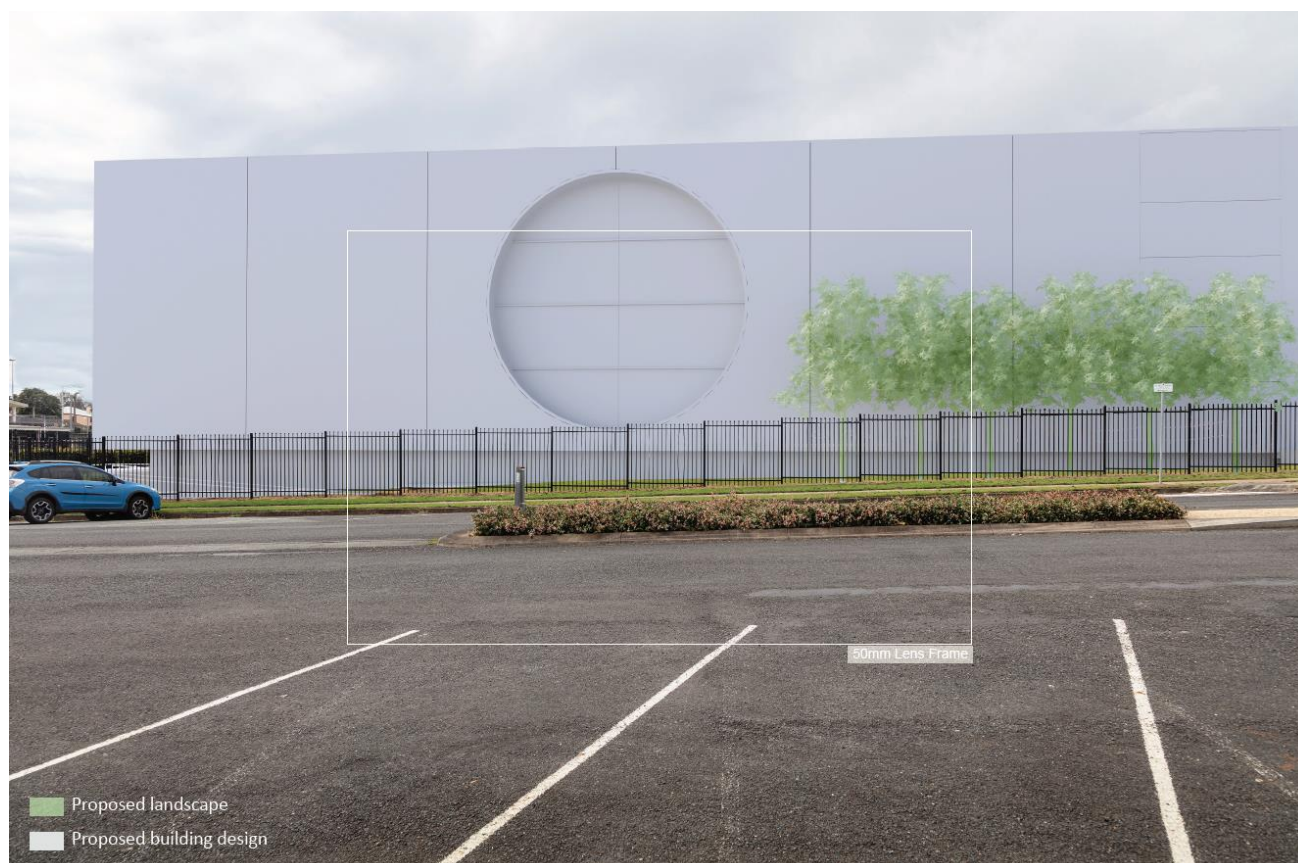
Viewpoint 5 – Owen Street adjacent to La Mer Apartments: proposed view
